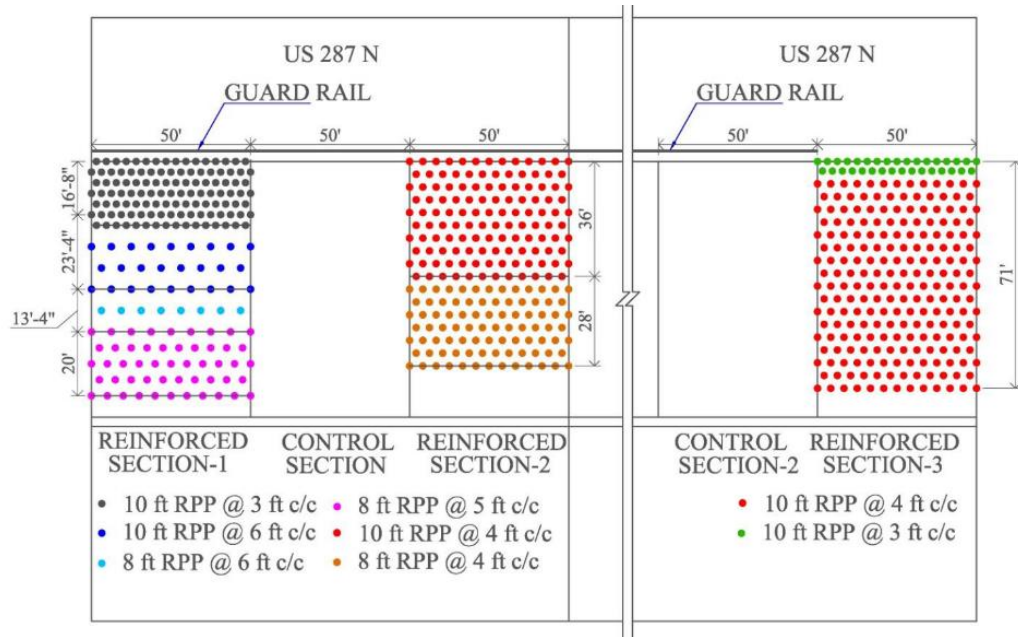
Slope stabilization plan using RPPs (Khan, 2014).
